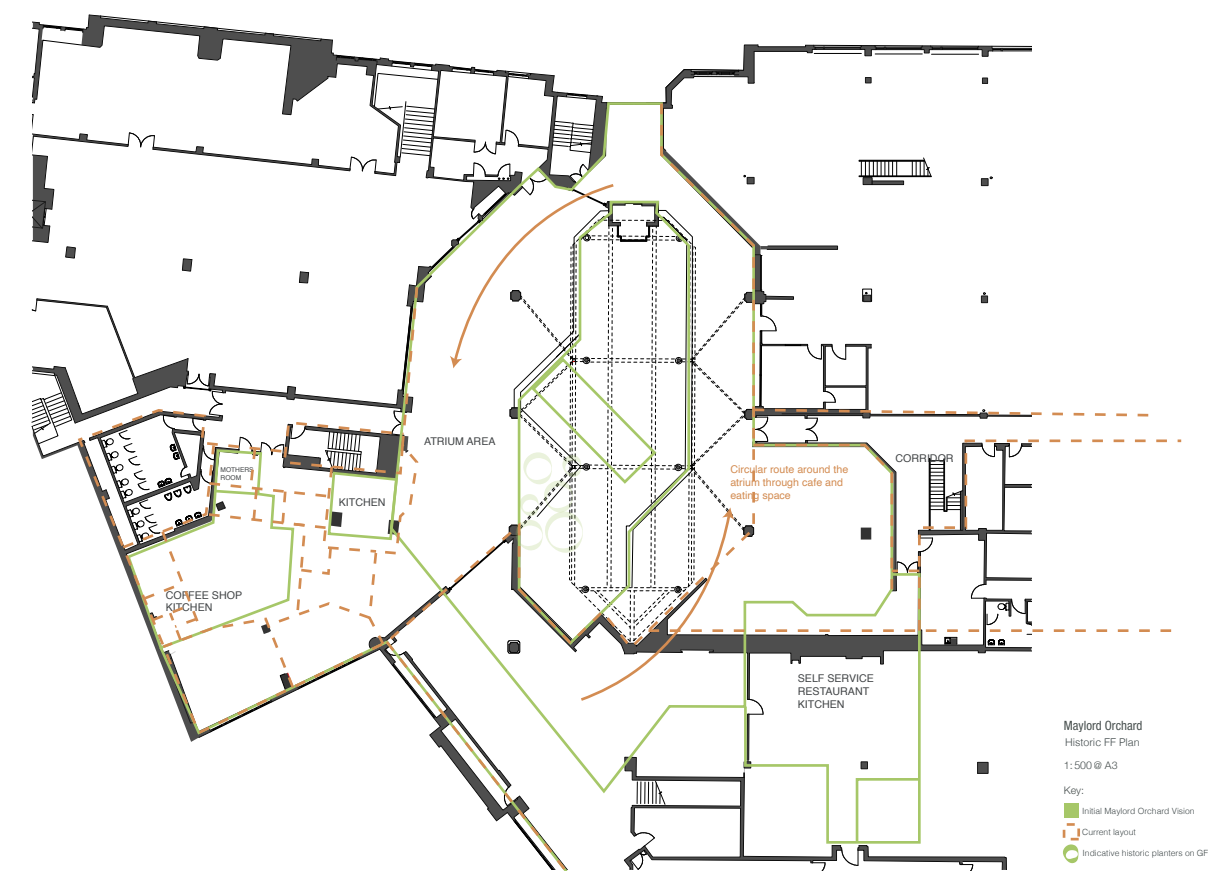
/ FF Plan / Available Space / 1:500 @ A3
